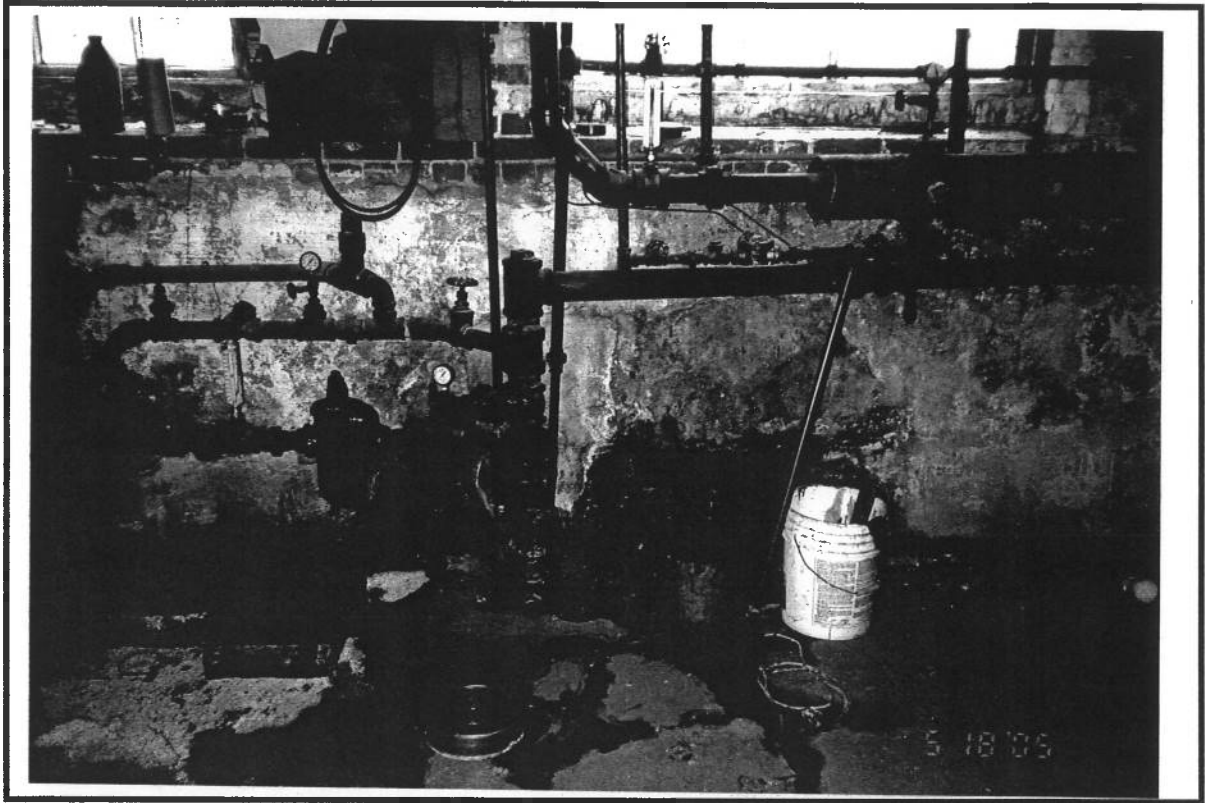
Within the lower level of the 125 Thames Street building (i.e., across from the 106 Thames Street paved parking area containing the two USTs), view of supply piping apparently originating from the USTs.
